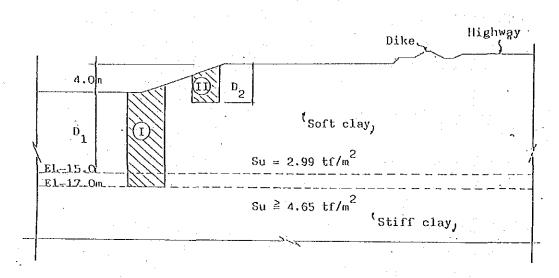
Improved Zone by Soil Cement Columns
